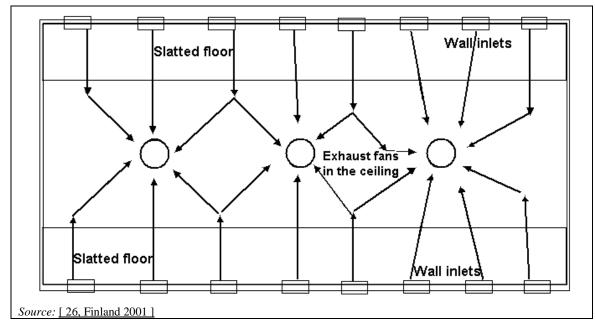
Schematic view of airflow in an exhaust ventilation system
